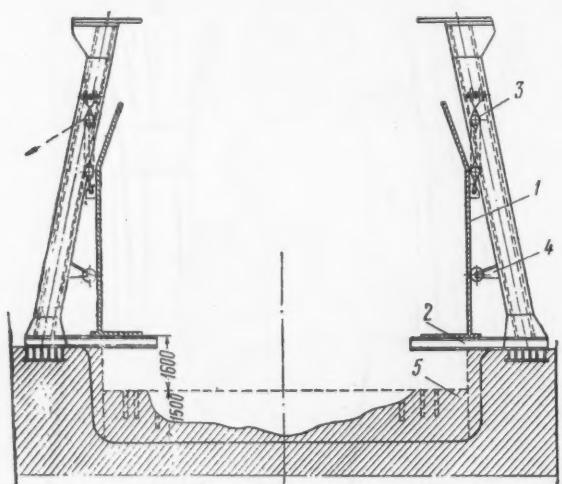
Digging up of the foundation and arrangement of the assembled crucible mantle; 1) crucible mantle, 2) cantilever beams for crucible-mantle erection, 3) tackle block, 4) guide rolls, 5) portion of foundation to be dug up.
